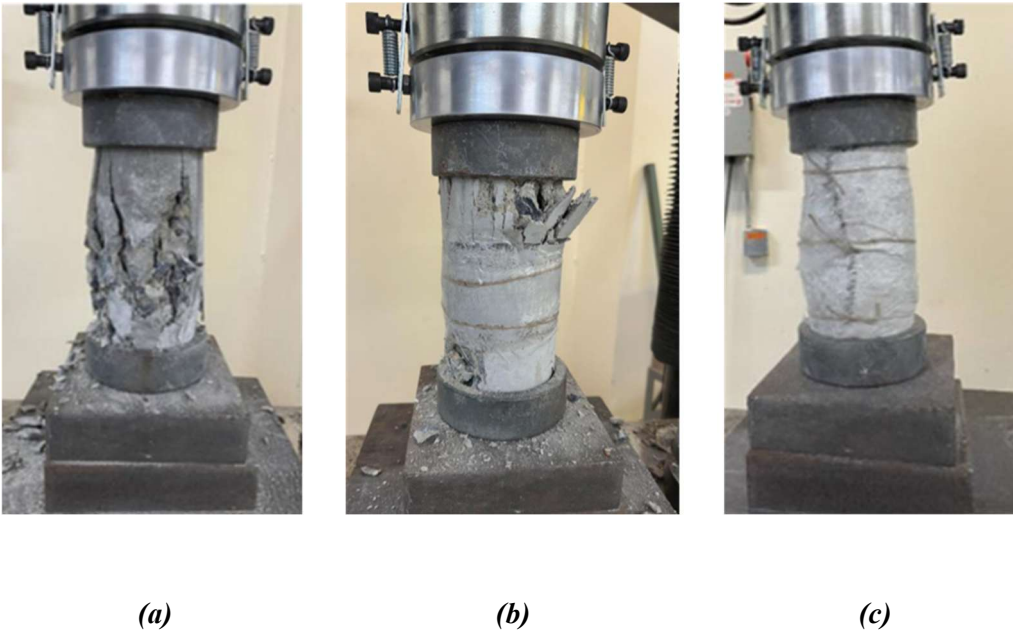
(a) Failure pattern of concrete cylinders for control specimen, (b) partially wrapped specimen, (c) full-length wrapped cylinder
